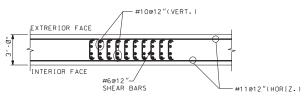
A-43 Reinforcement Arrangement of the AB MCR Wall (Section 1)
